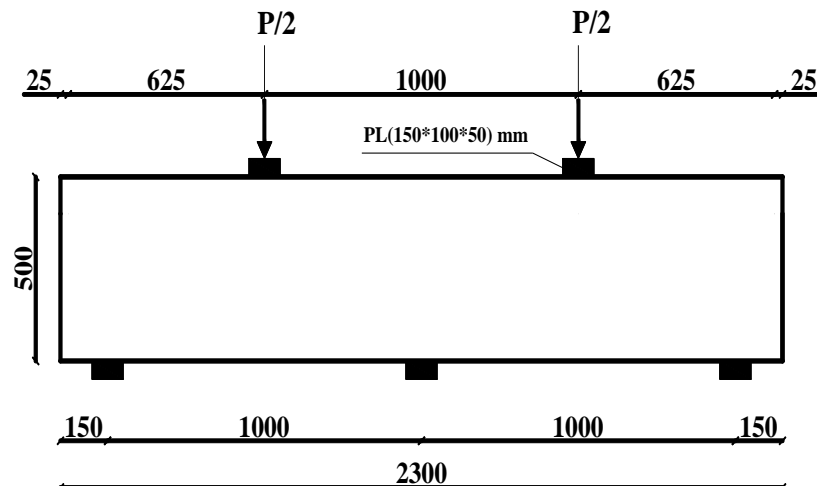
Geometrical Dimensions of the Tested Deep Beams (dimensions in mm)
